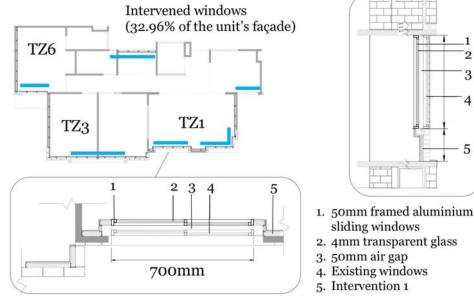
Plans and details of interventions 1 and 2 in unit B.
